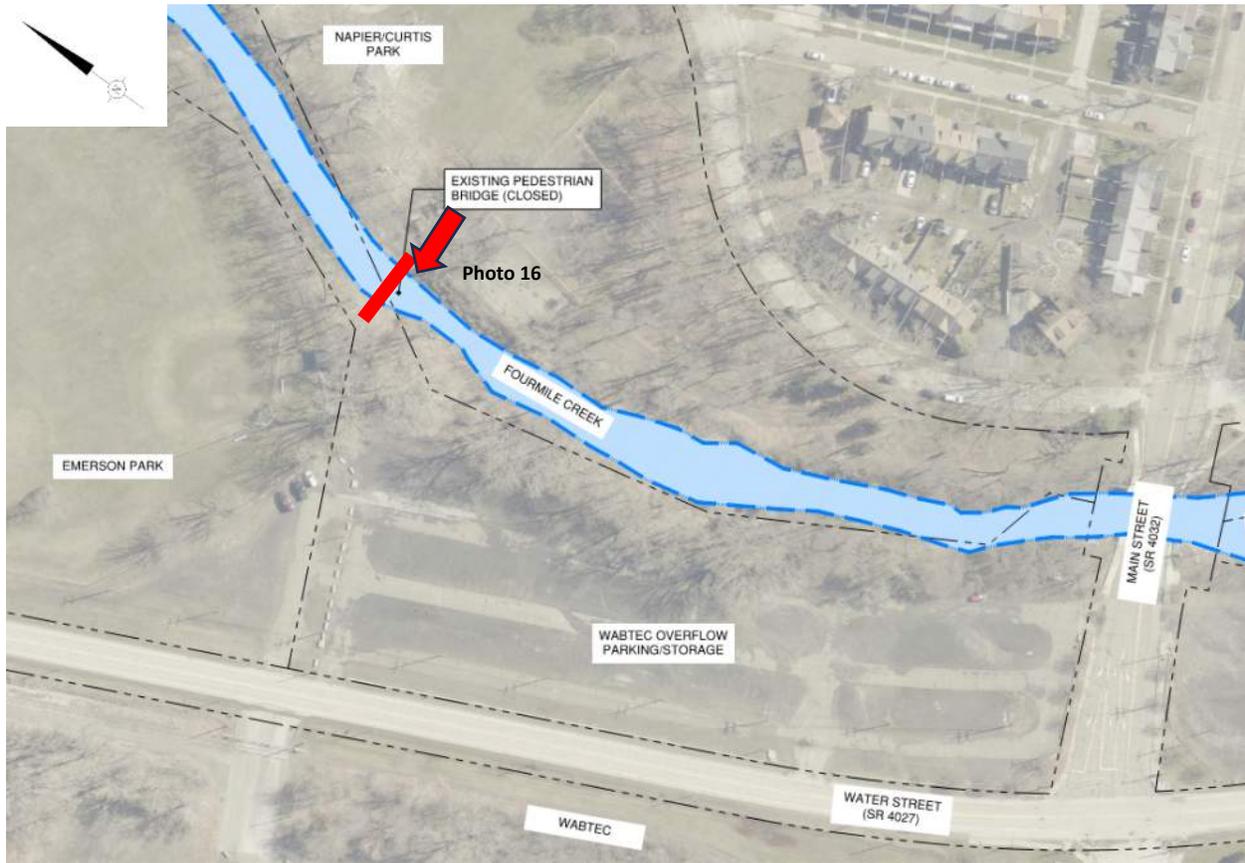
Existing conditions and location of Napier/Curtis Park Pedestrian Bridge and Emerson Park.
